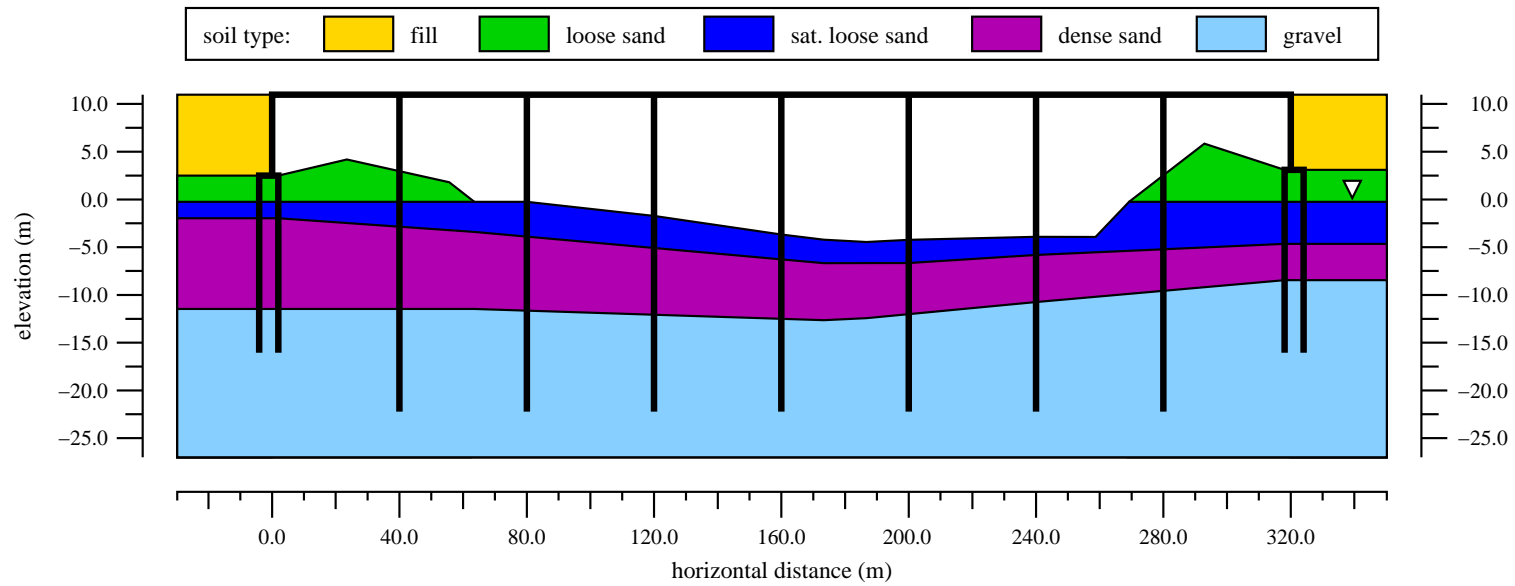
Elevation view of bridge and idealized soil profile (vertical scale increased). Horizontal datum is at the northeast bridge abutment.
